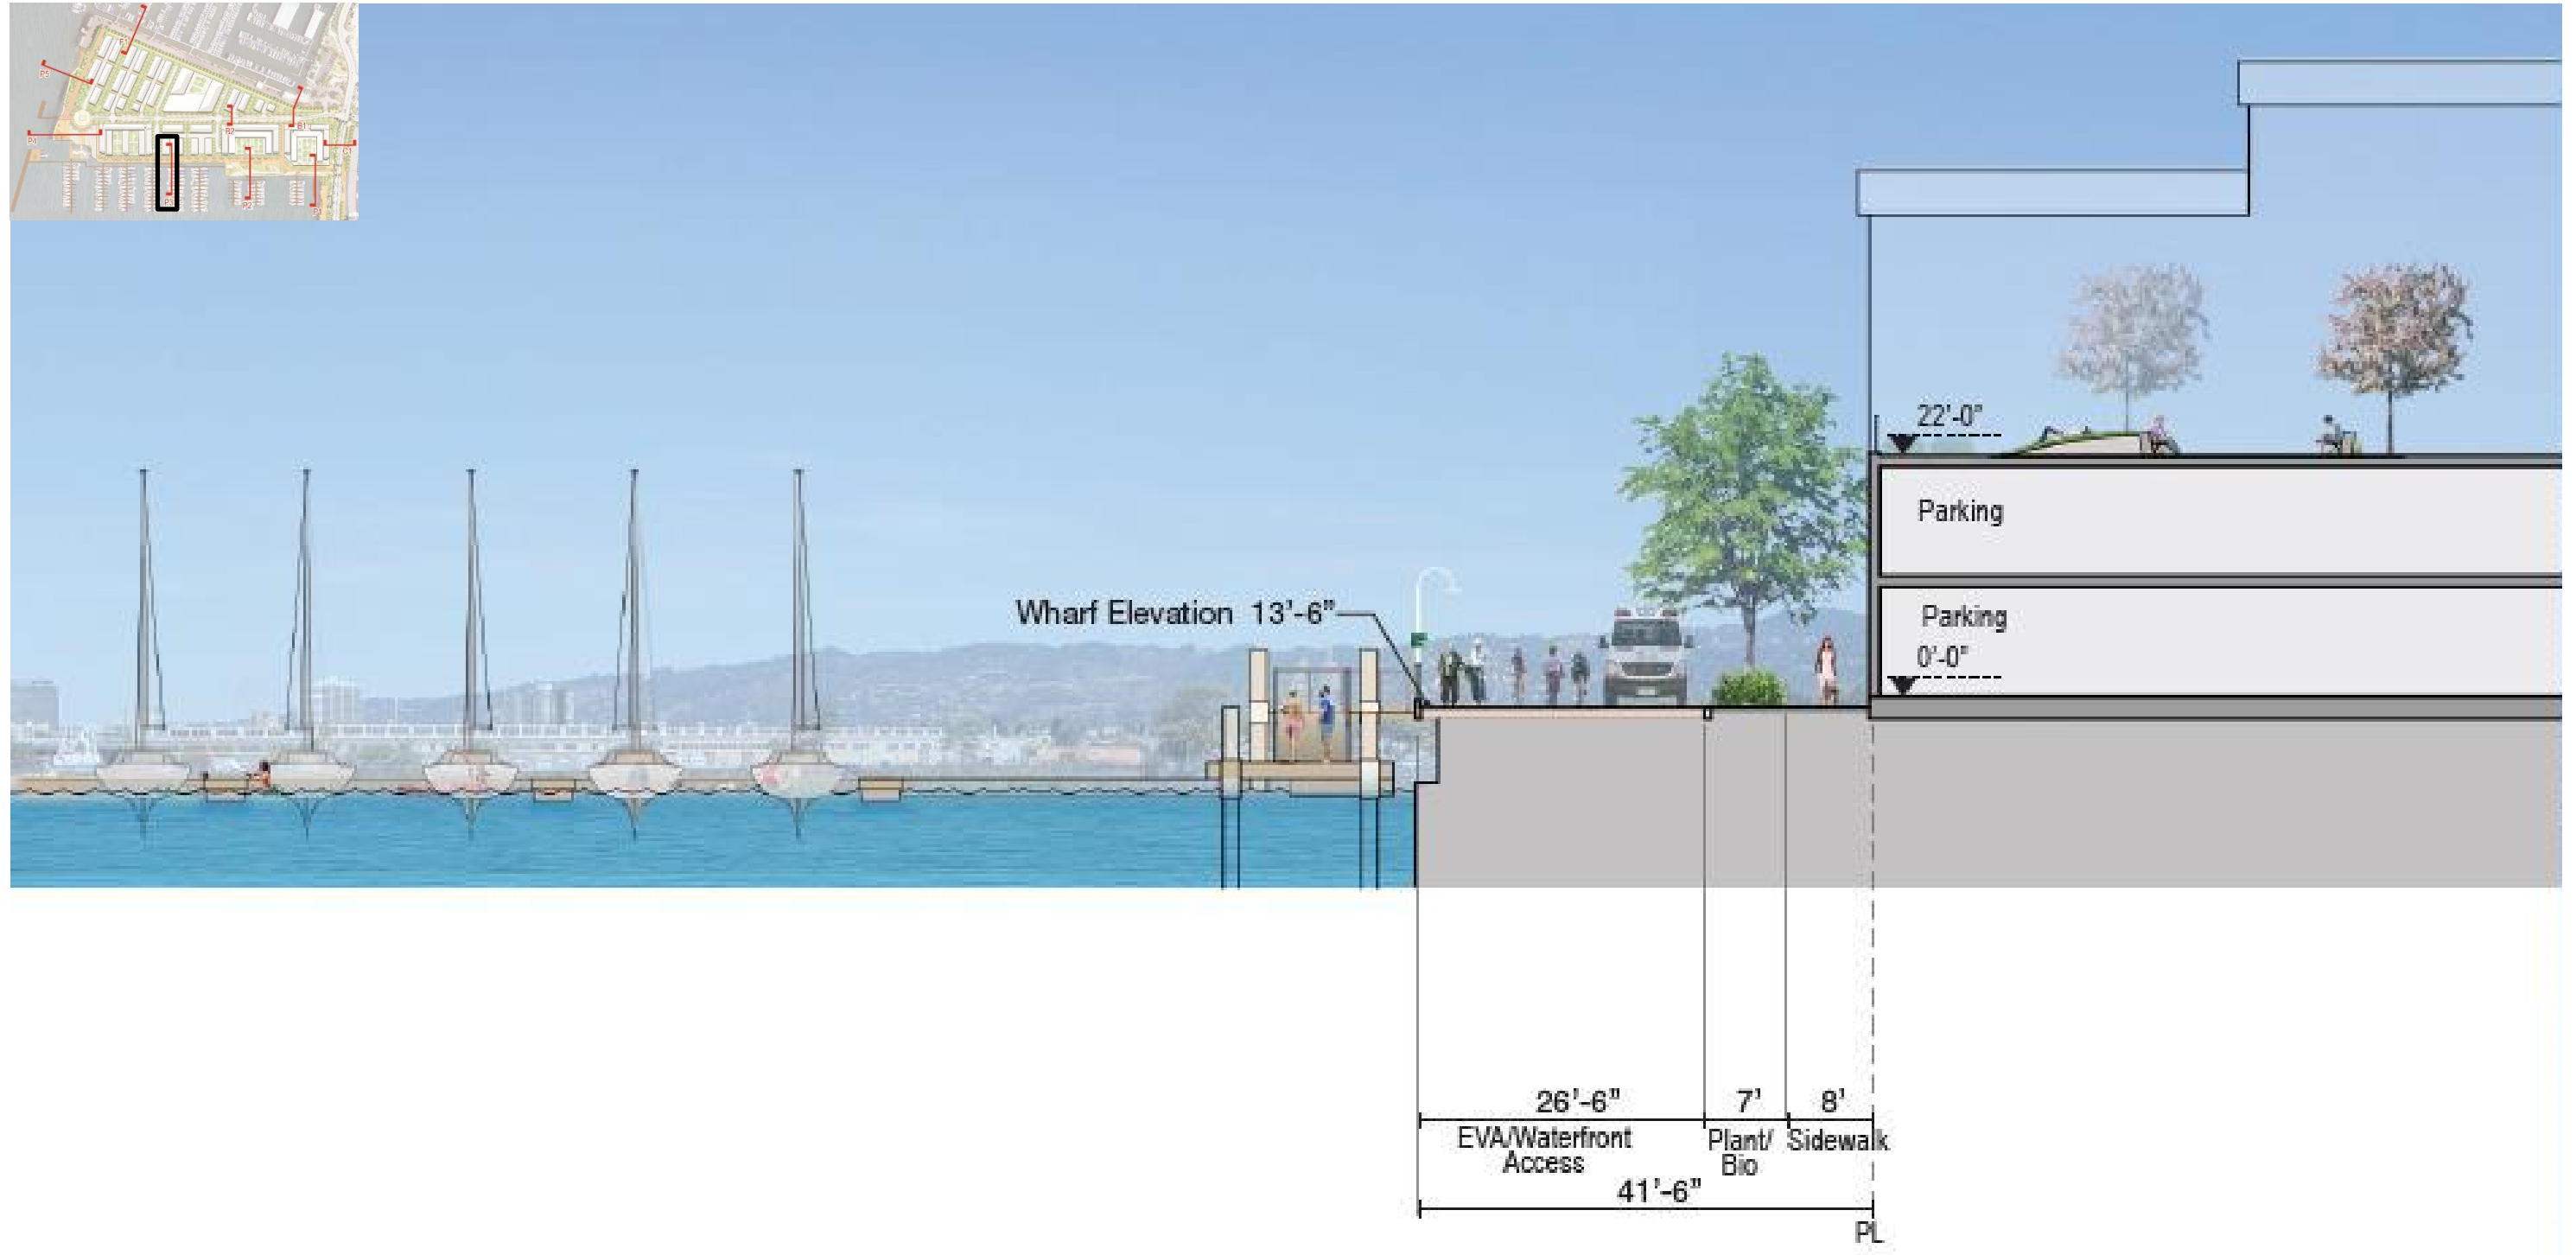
Illustrative Cross Section P3: Waterfront Promenade and Bay Trail adjacent to Alaska Basin District (view looking north)
